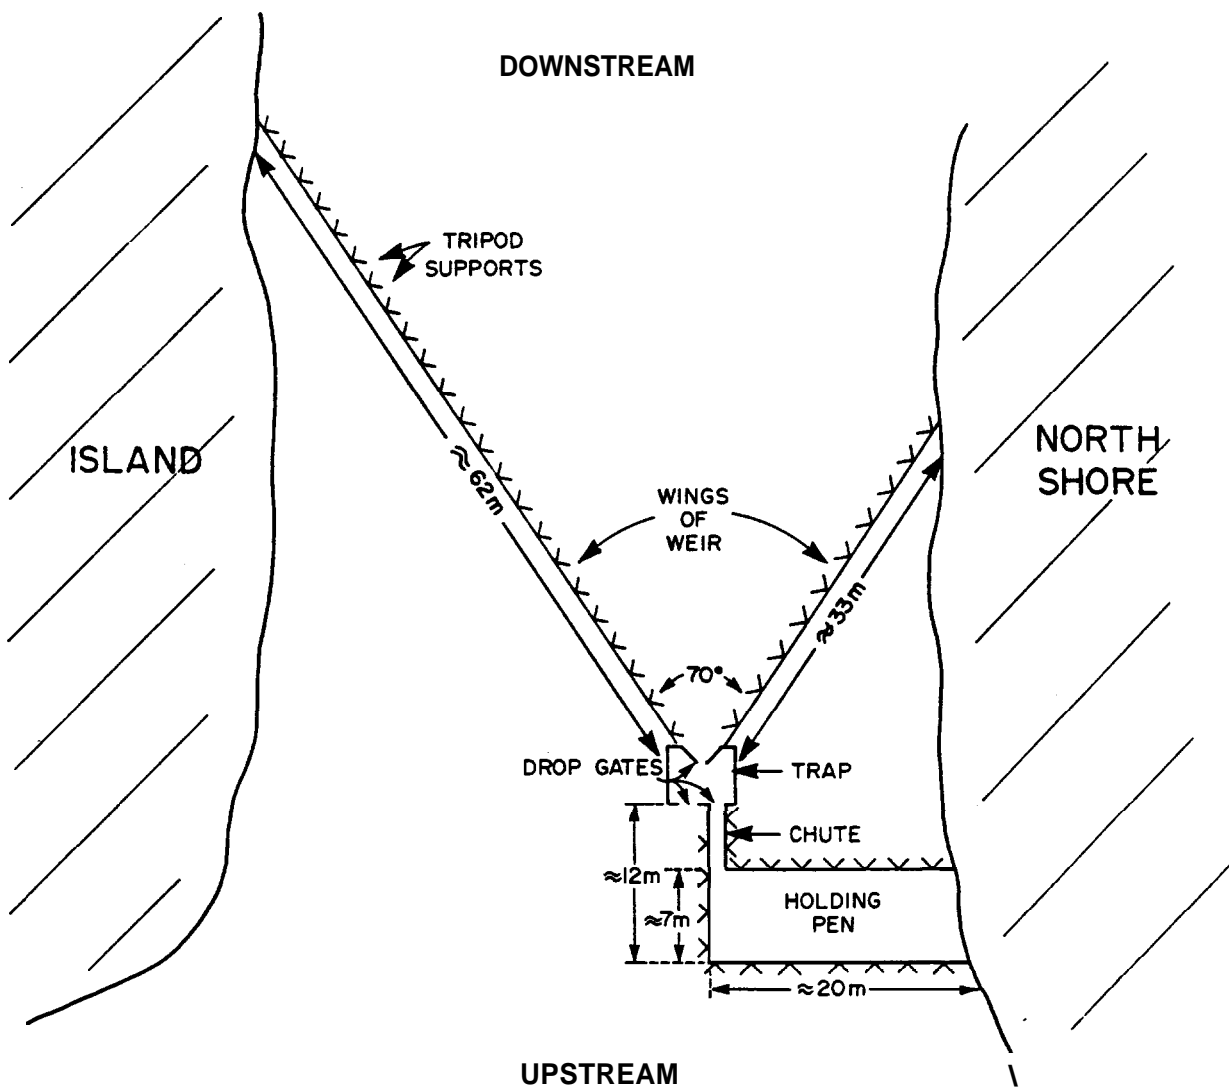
Layout of conduit pipe weir and trap used for counting and commercial fishing in 1981, showing dimensions of structures.
